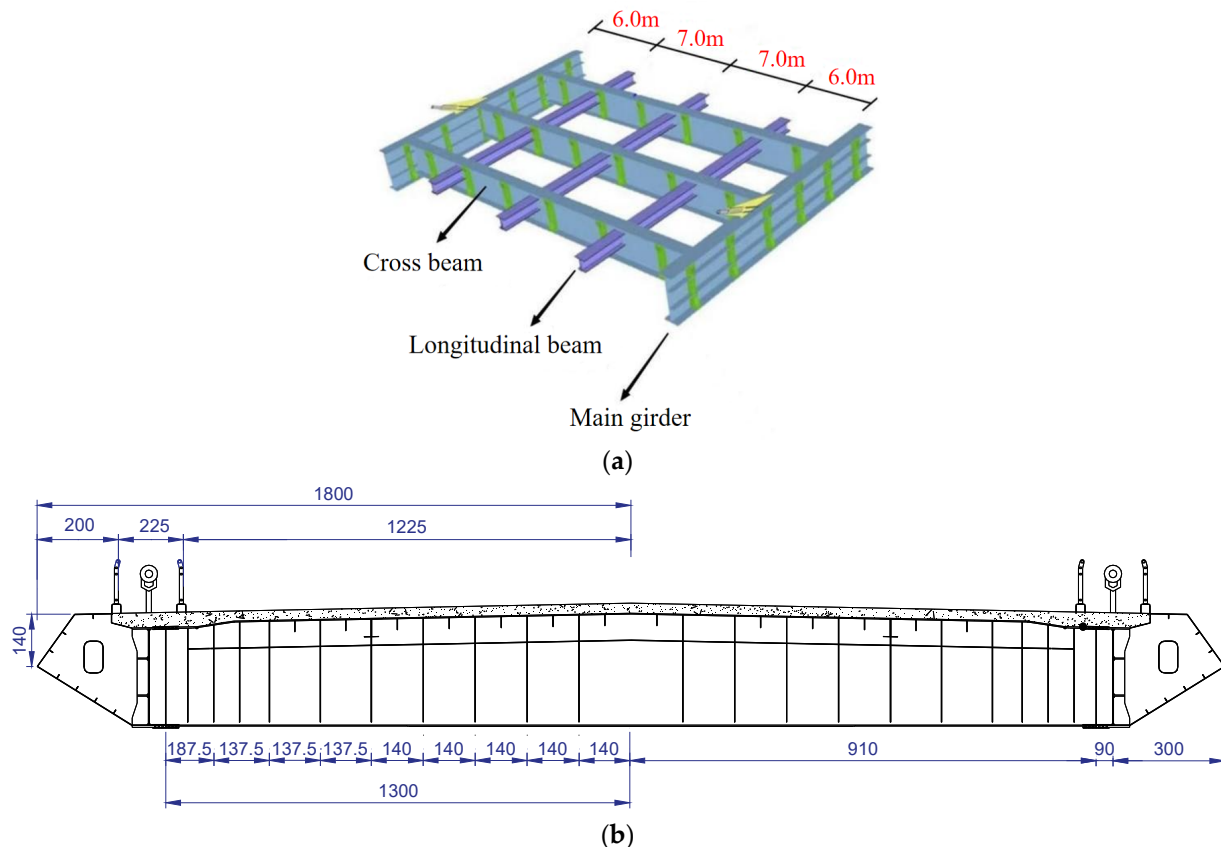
Structural components of the bridge deck: (a) prefabricated steel frame; (b) schematic diagram of bridge cross section (unit: cm).
